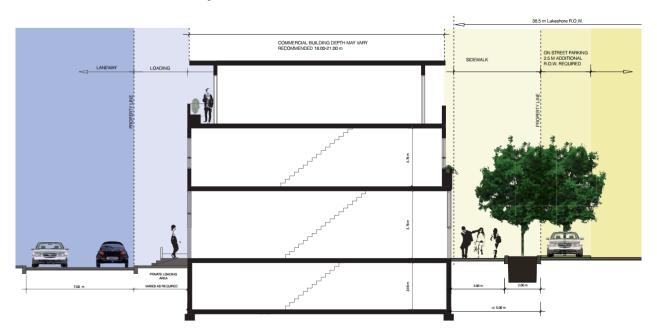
Marine Parade Drive – Commercial Buildings Planned Streetscape
